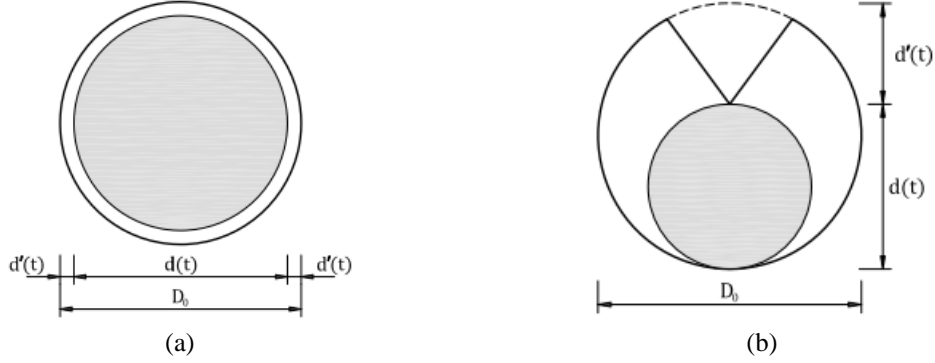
Geometry of the corroded reinforcing bar, (a) uniform corrosive attack and (b) corrosive attack on one side only
